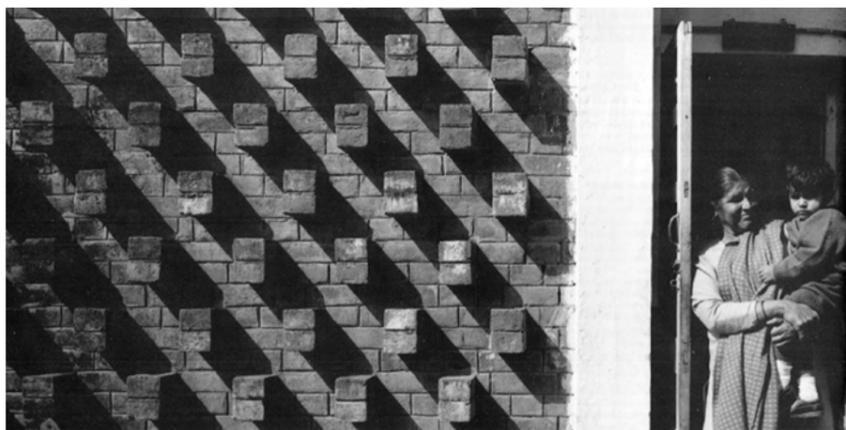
Pierre Jeanneret, House Type 11-JB. Solar protection Brick bond system. Foundation Le Corbusier. © Kiran Joshi
